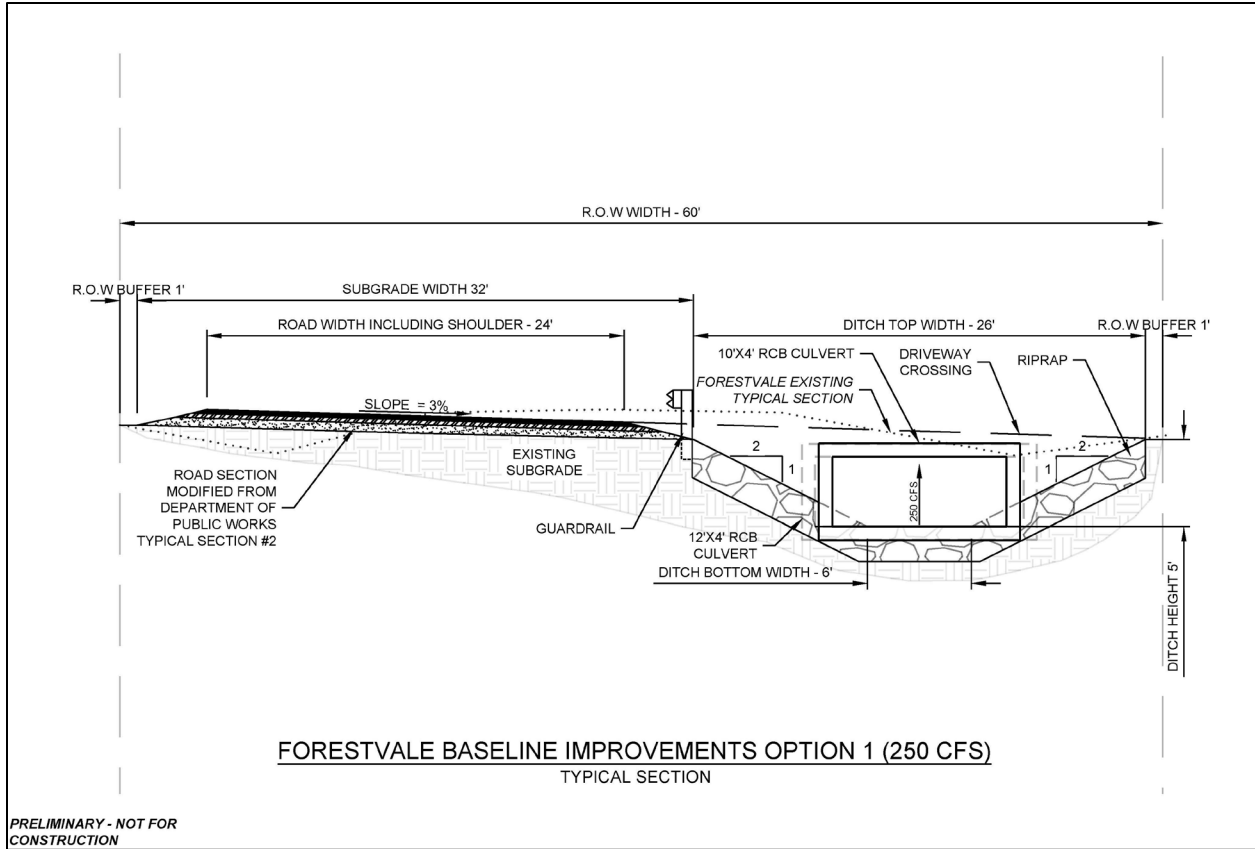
Typical section for the roadside ditch and RCB culvert layout for Forestvale Baseline Improvements Option 1.
